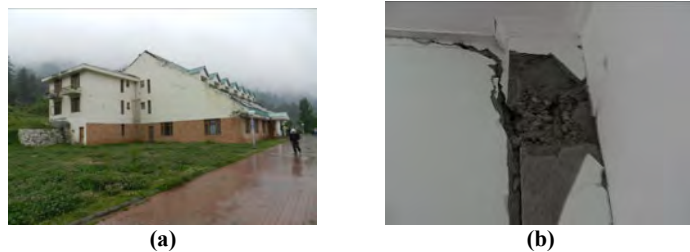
(a) TRC building in Badarwah, (b) damage to column tops showing poor concrete and reinforcement detailing
